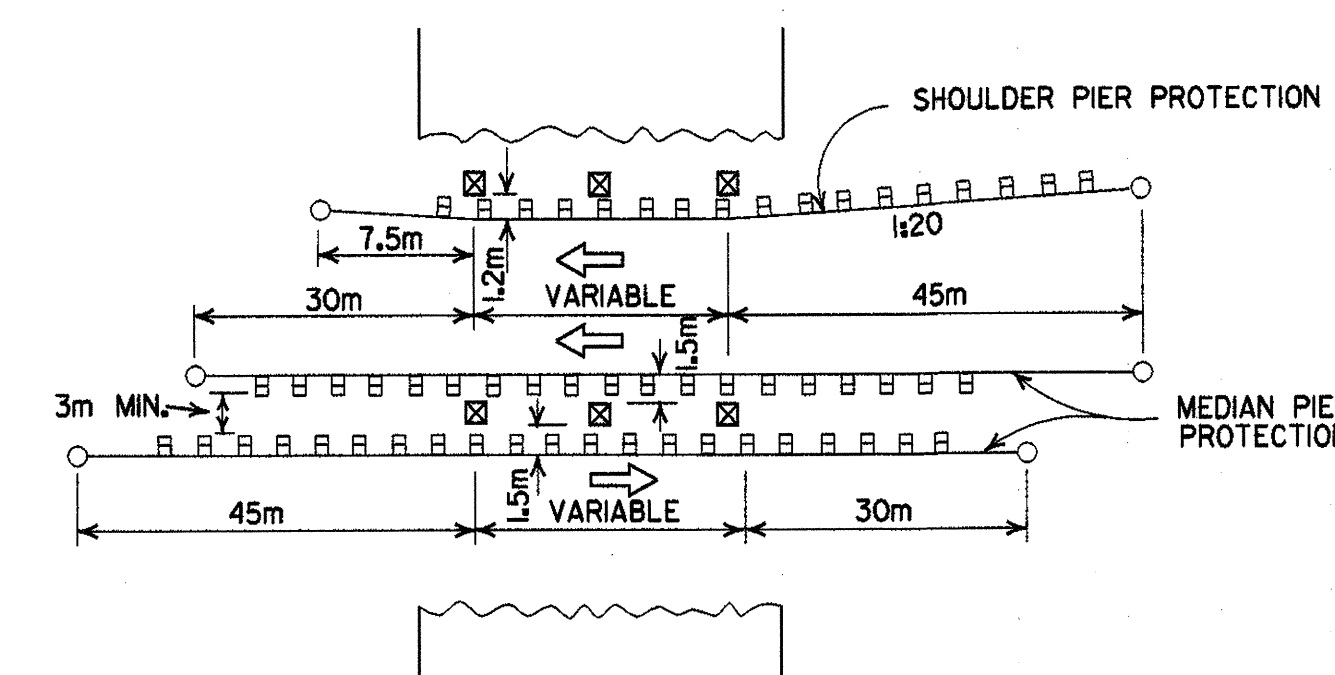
DETAILS SHOWING POSITION OF GUARD RAIL ON HIGHWAY
